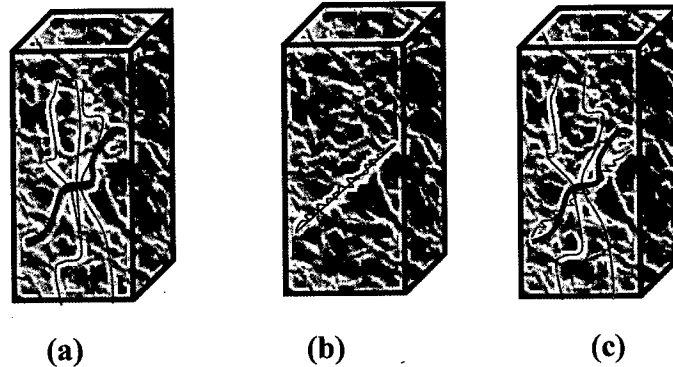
Modes of failure (a) Concrete failure ,(b)Bond failure ,
